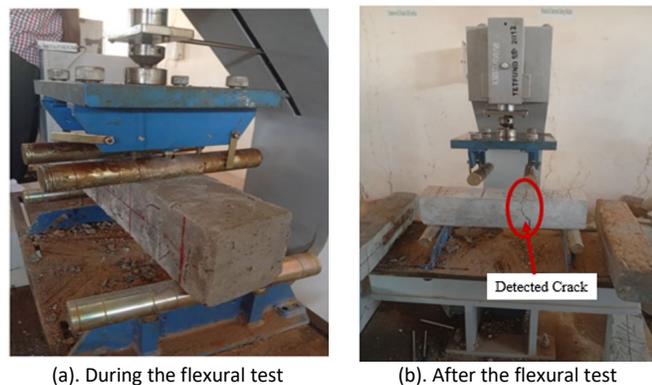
Flexural strength assessment of the bamboo-reinforced concrete beam specimens
